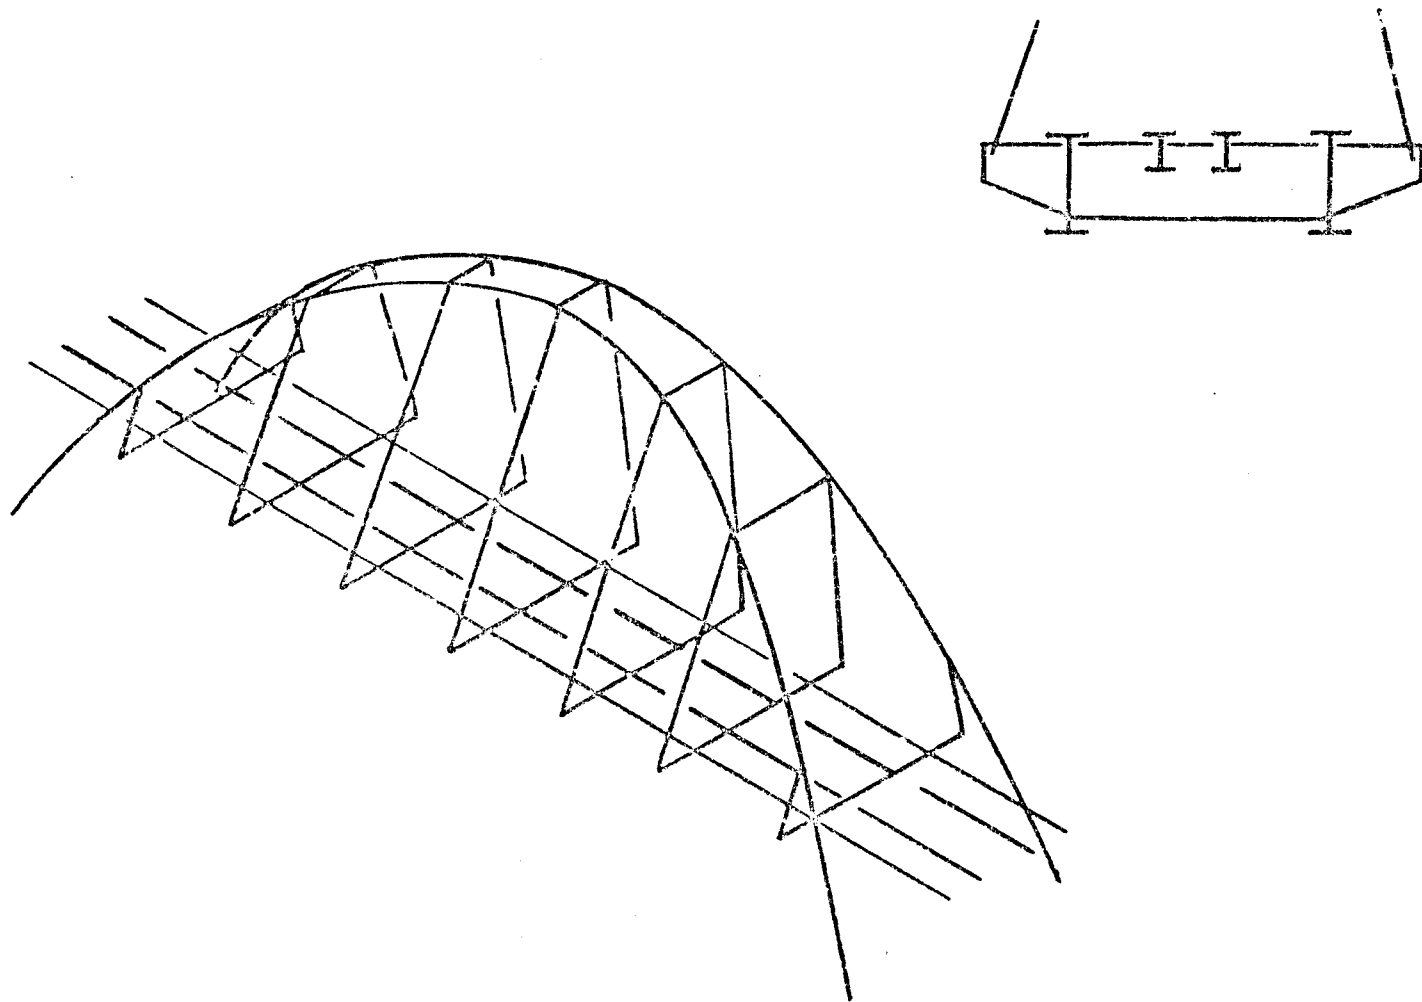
LEANING ARCHES BRIDGE CONCEPT APPLIED TO NEW BRIDGE CONSTRUCTION
